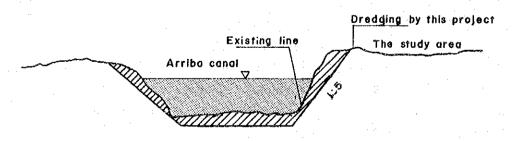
TYPICAL SECTION OF ARRIBA CANAL
